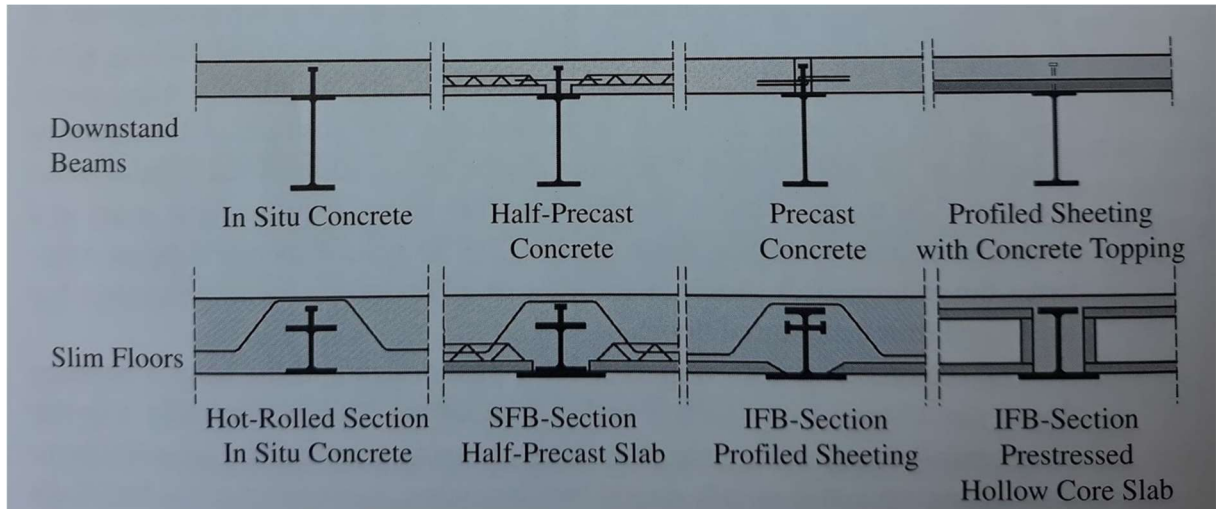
Downstand and slim floor beams with different slab types (Hauke, Kuhnhenne, Lawson and Veljkovic, 2016)
